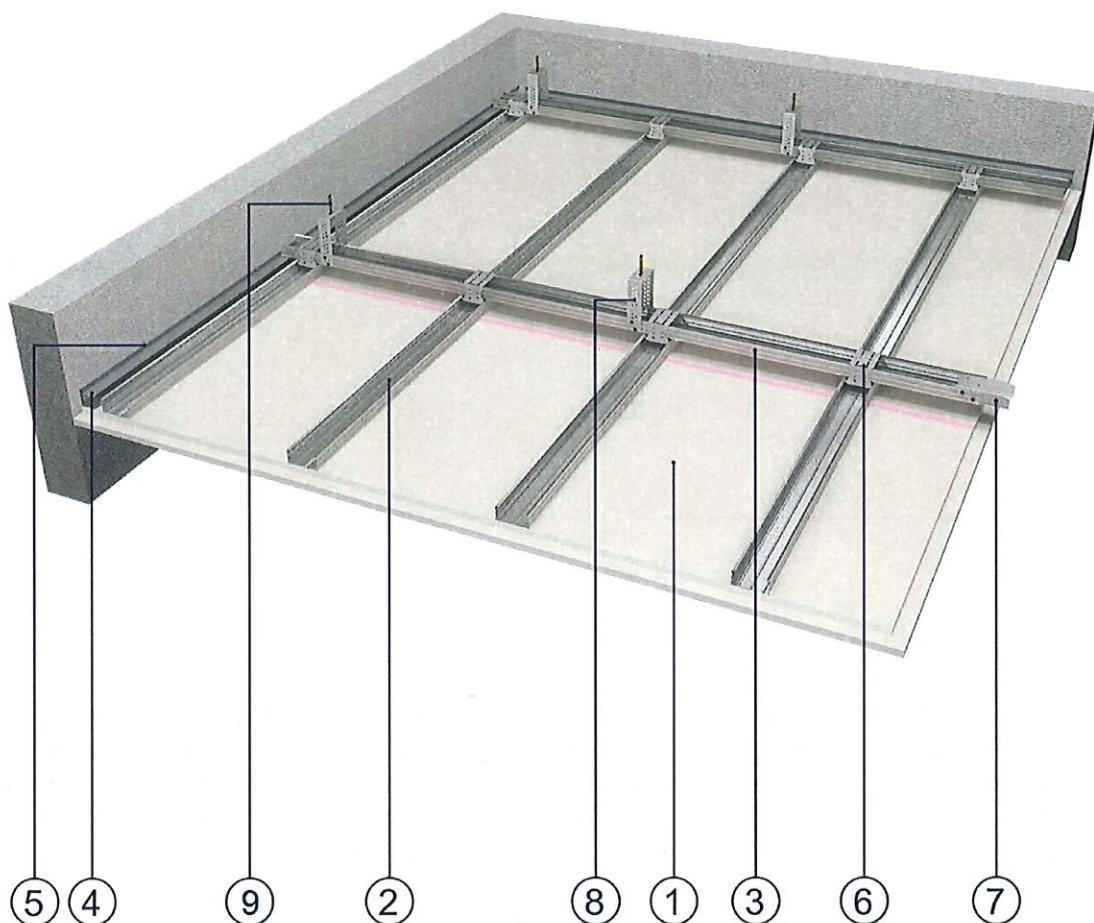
View of the suspended ceiling – two level cross construction with rotating hangers with springs
